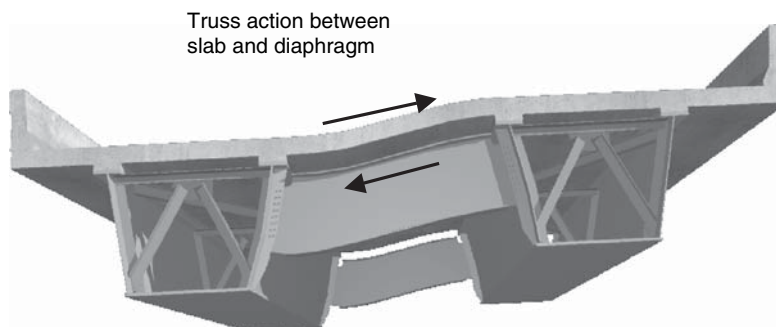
Schematic of twin composite tub girder superstructure showing internal redundancy provided by bracing system and possible alternative load path provided by slab and diaphragm. (Courtesy: HNTB.)
